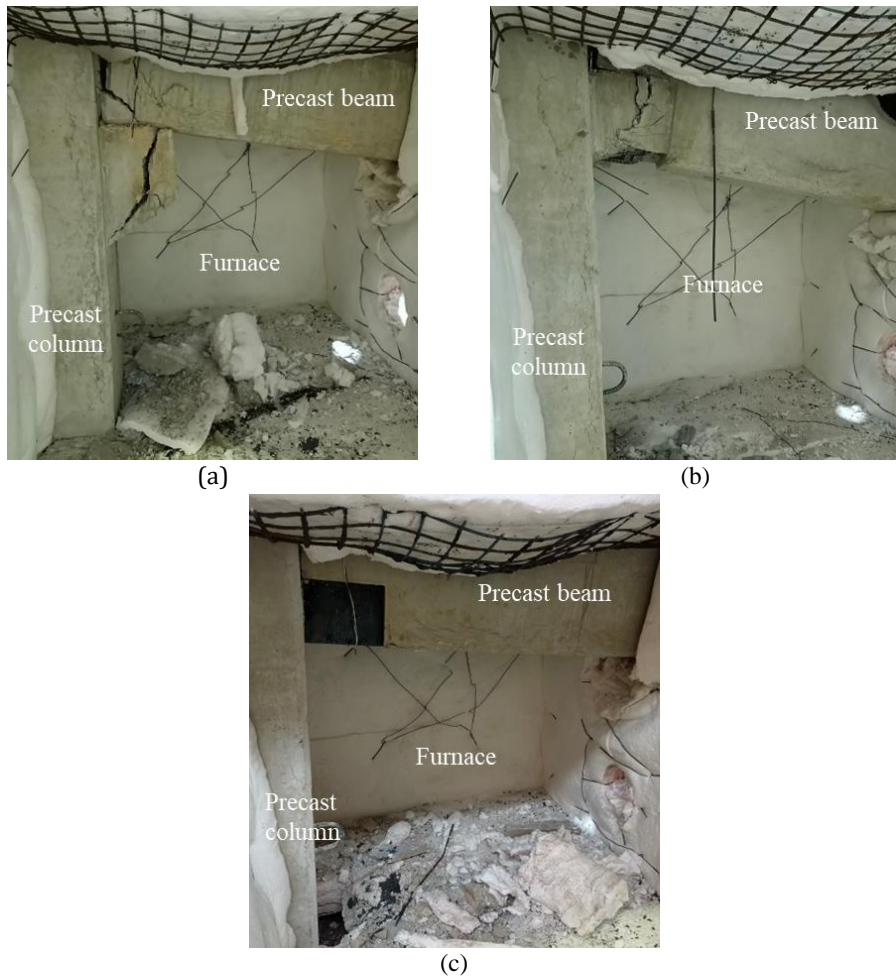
Fire damaged of precast concrete beam to column connections: (a) concrete corbel, (b) concrete nib, and (c) inverted E steel nib (13).
